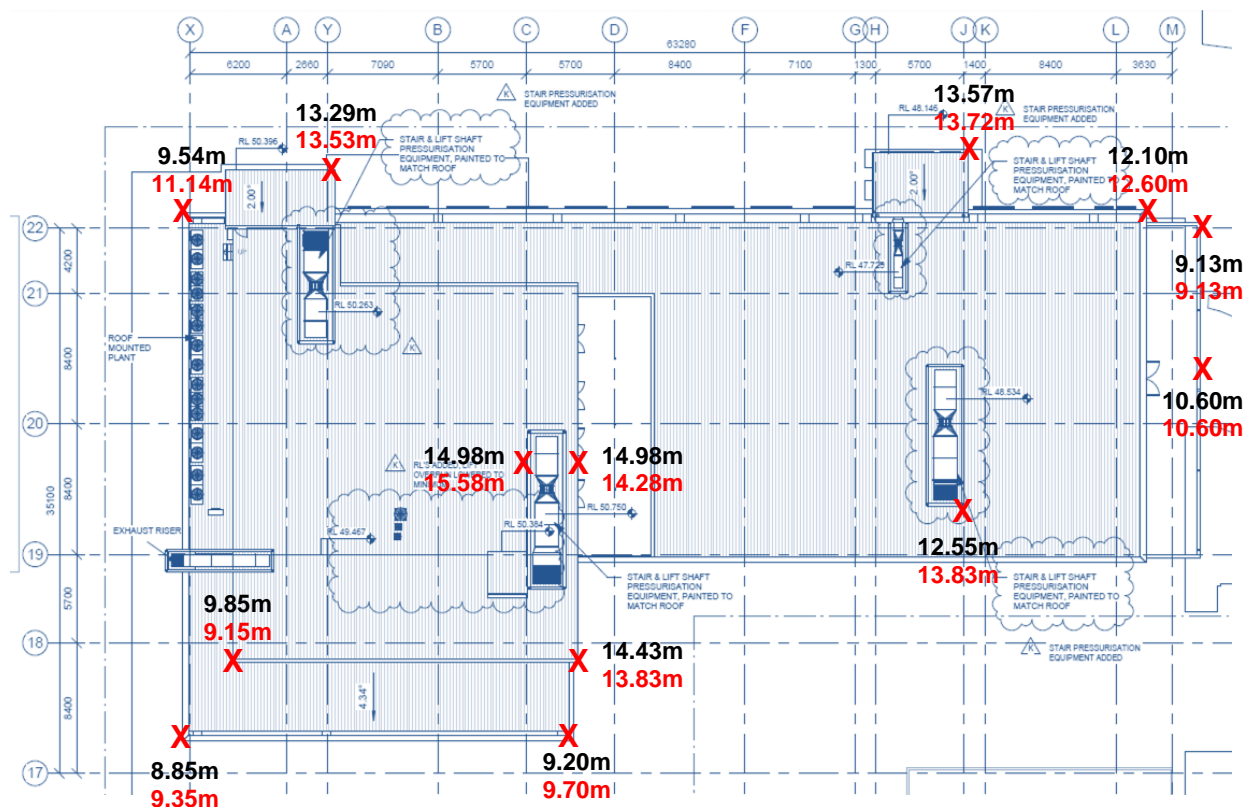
Roof plan with approved heights (in black text) and proposed heights (in red text)
